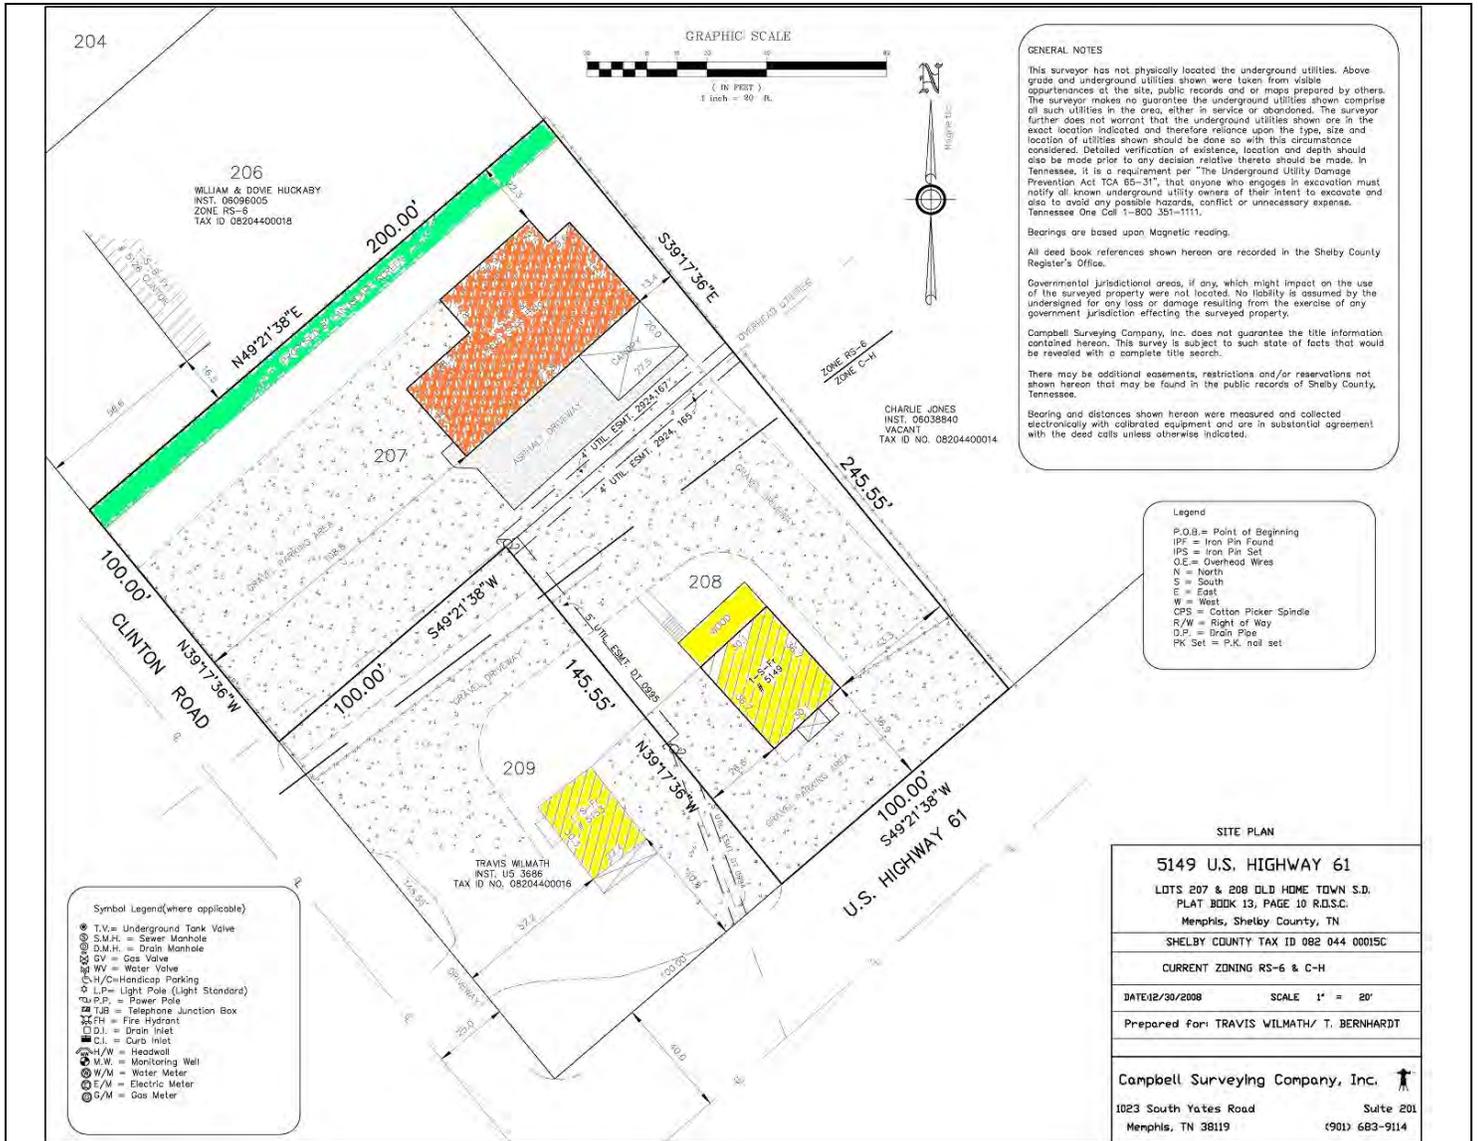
The proposed site plan shows the two pre-existing buildings, original built as "single-family" houses, the "metal shop building" and a proposed 8-foot landscape strip inside the area as currently fenced.
